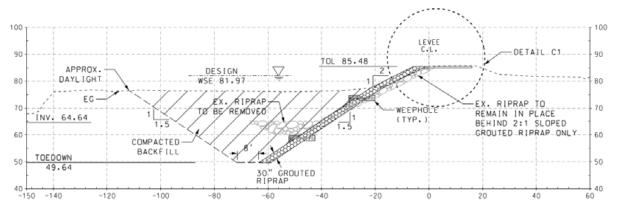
Typical Cross Section of Alternative 3, Grouted Riprap for Design Flow (Sta. 270+00)
